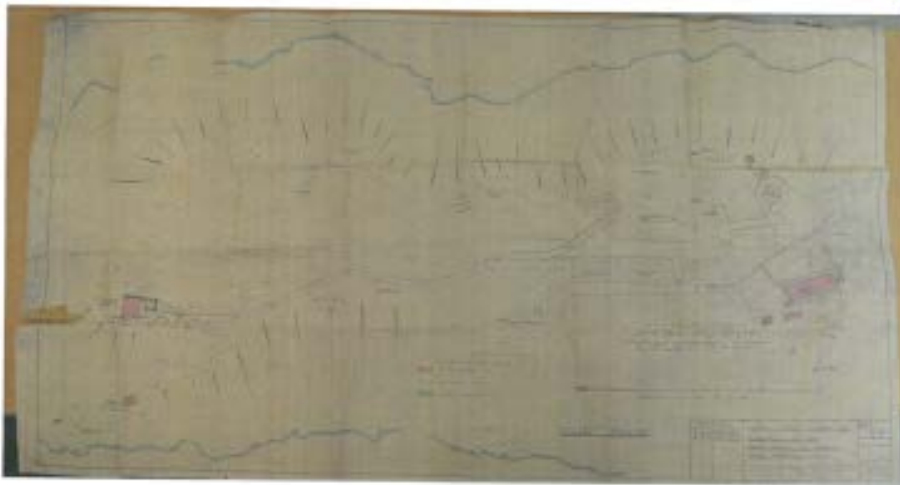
Drawing showing the Royal Navy Building (Source: ASD)
